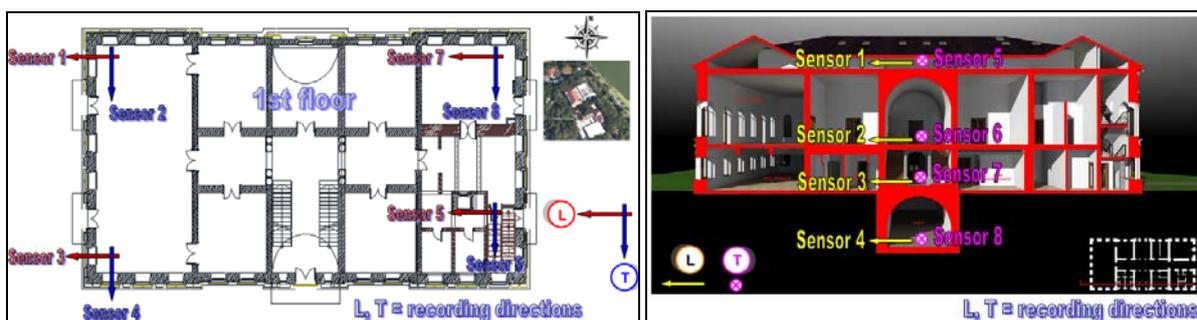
Location of sensors at the 1st floor and on a vertical arrangement.
